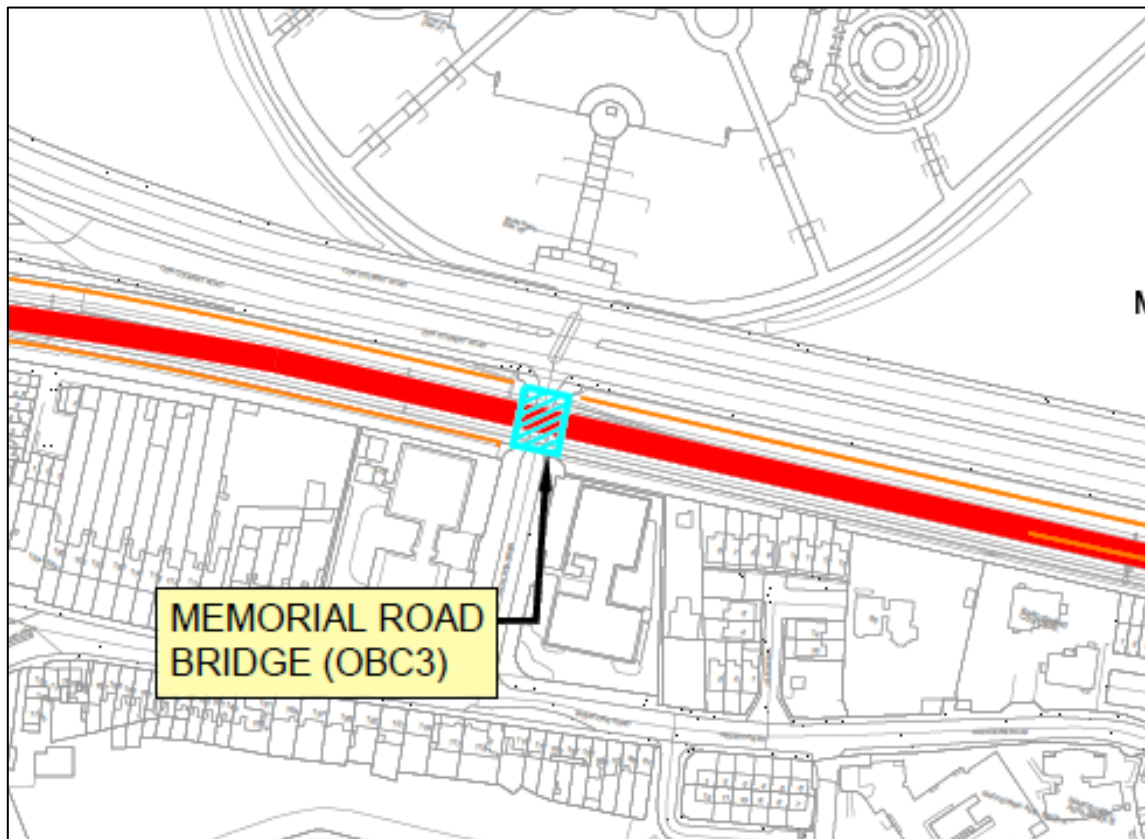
Emerging Preferred Option around Memorial Road Bridge
